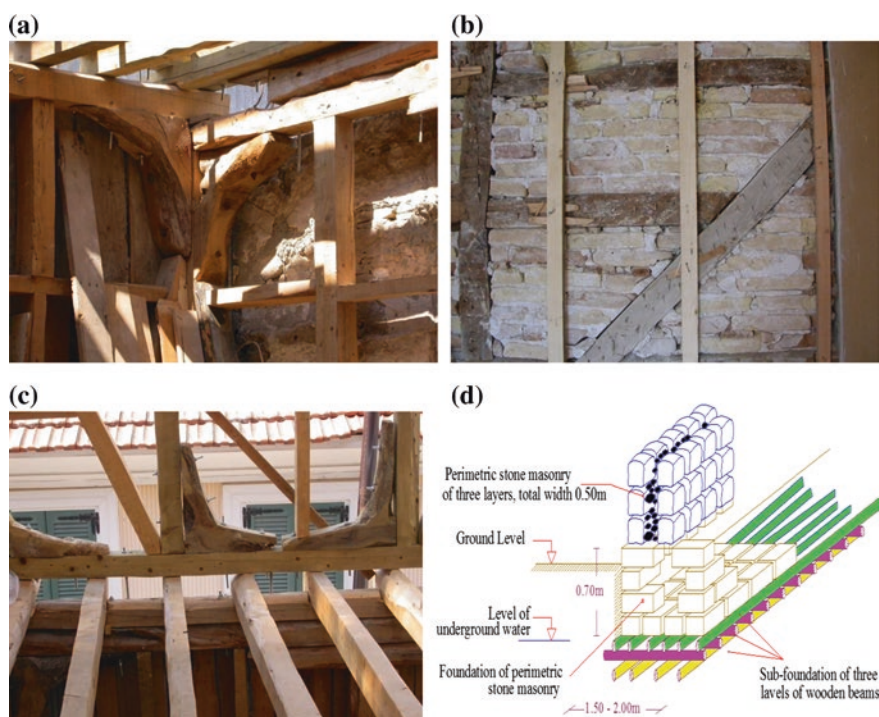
a,b The wooden frame of the upper storey. c Detail of the wooden joint elements. d The foundation form of these buildings
